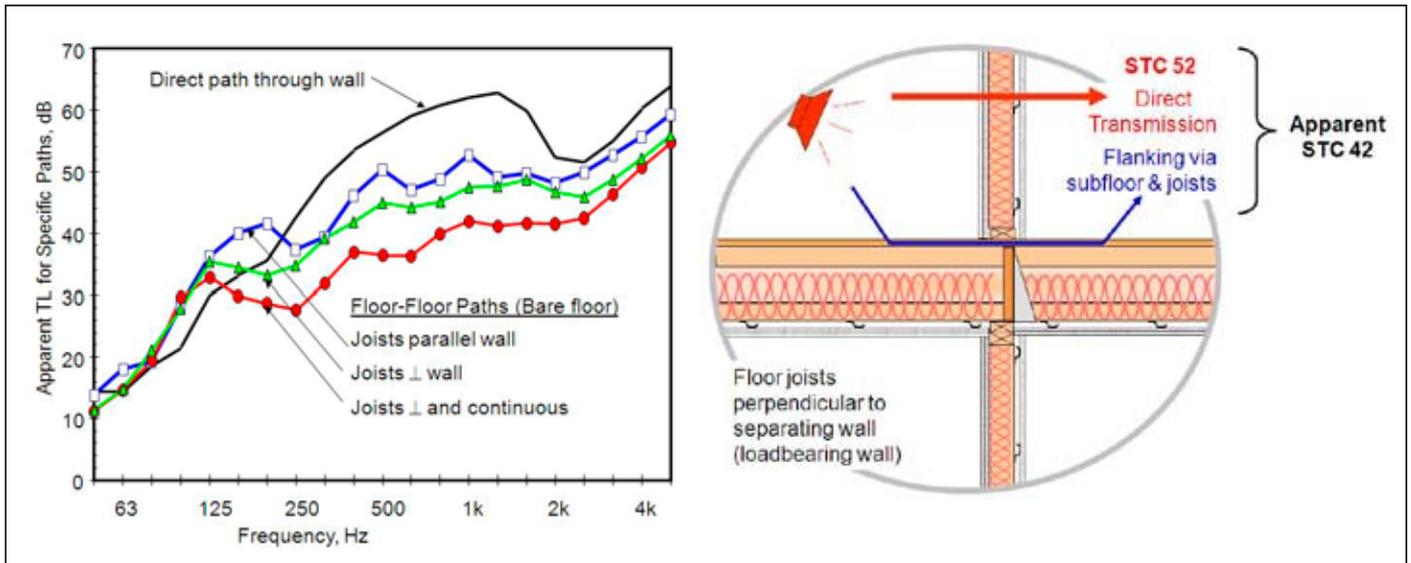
Modifying the wall/floor system of Figure 8 by reorienting the floor joists to run perpendicular to the separating wall lowers the ASTC for the system, due to increased transmission via the floor surfaces.
